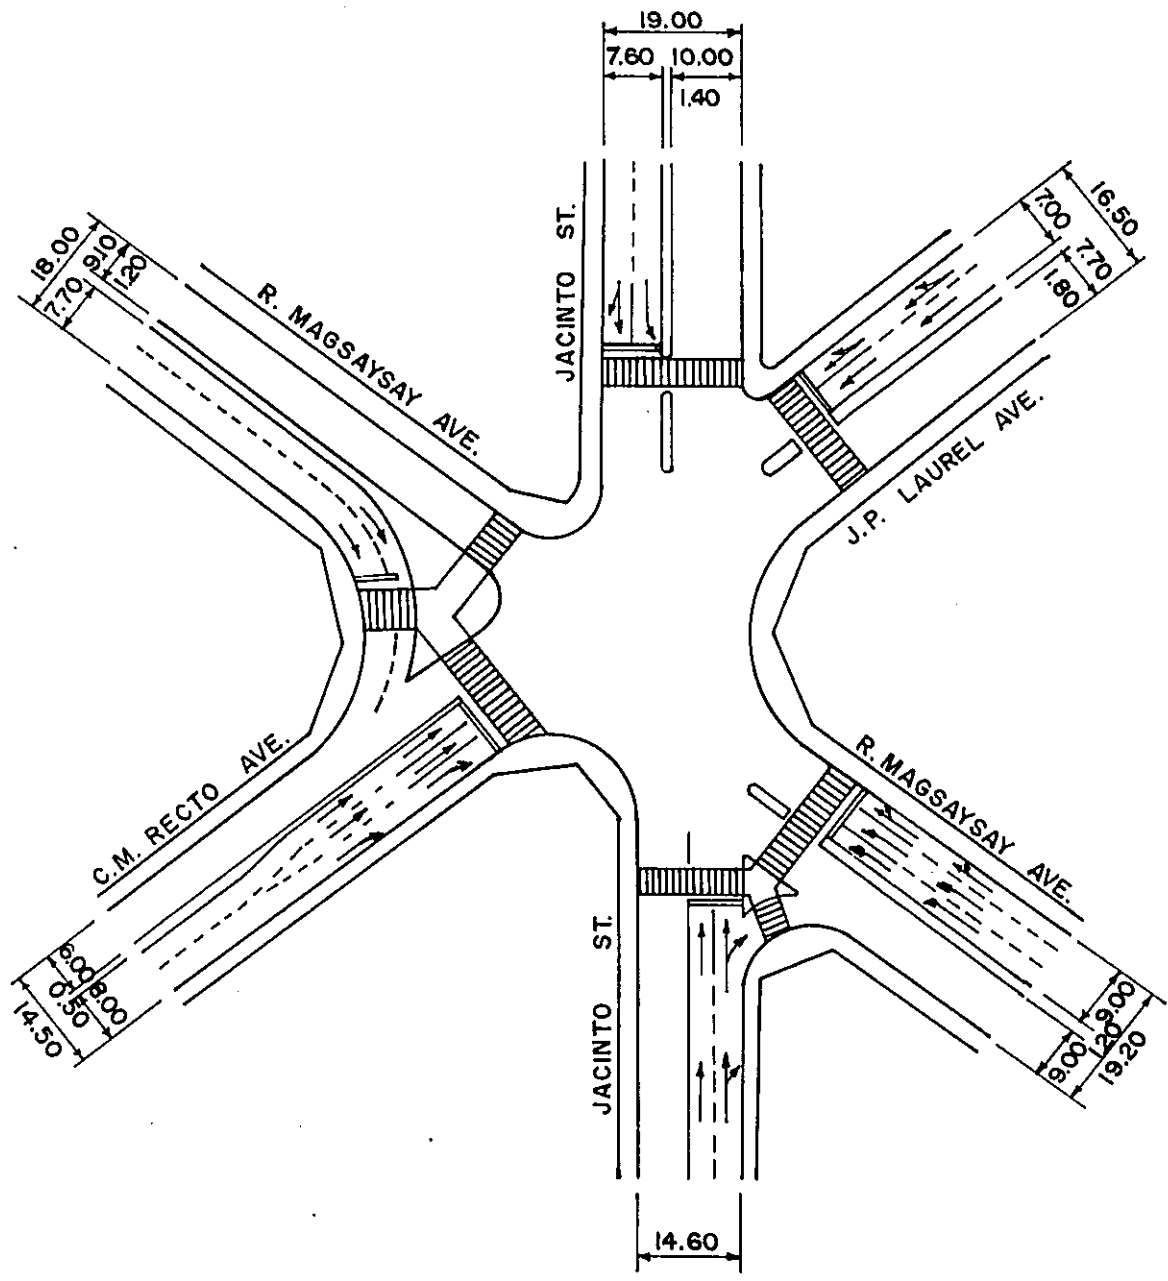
(b) DIRECTIONS PROHIBITED TO PASS THROUGH UNDER THE RECOMMENDED PLAN.
